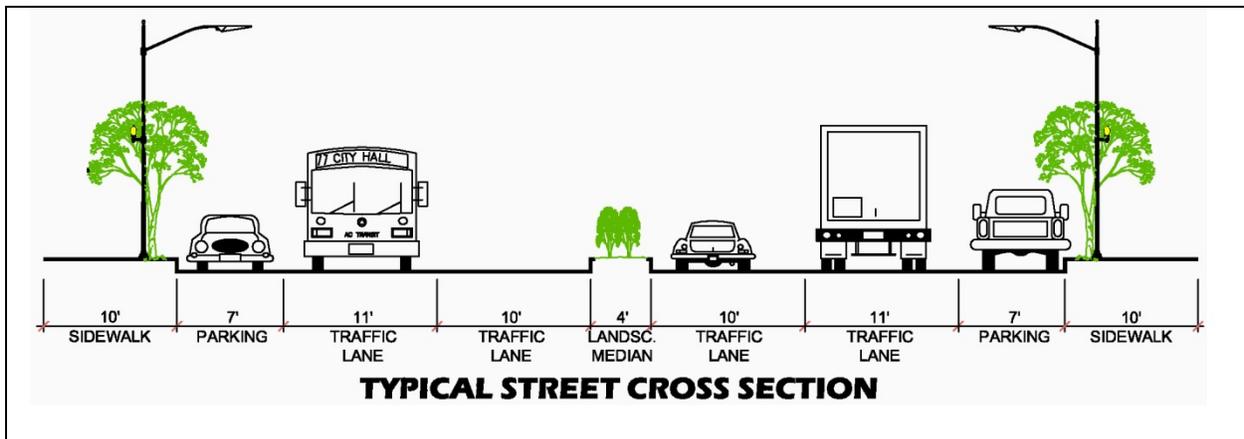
Preferred Plan: Cross Section of Mission Boulevard North of A Street
